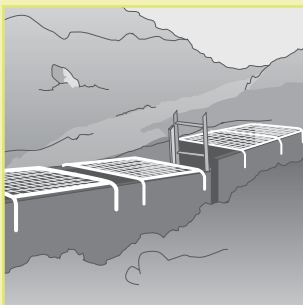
Fall prevention for trenching works - steel mesh covers over trench shields.
